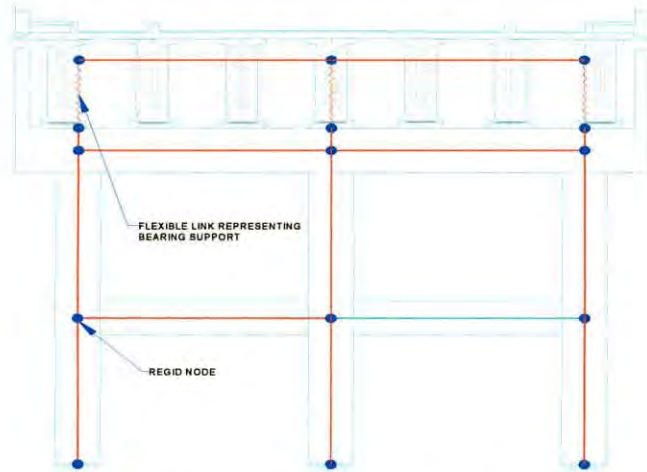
Skeleton of a Bridge Bent of Shah Paran Bridge
